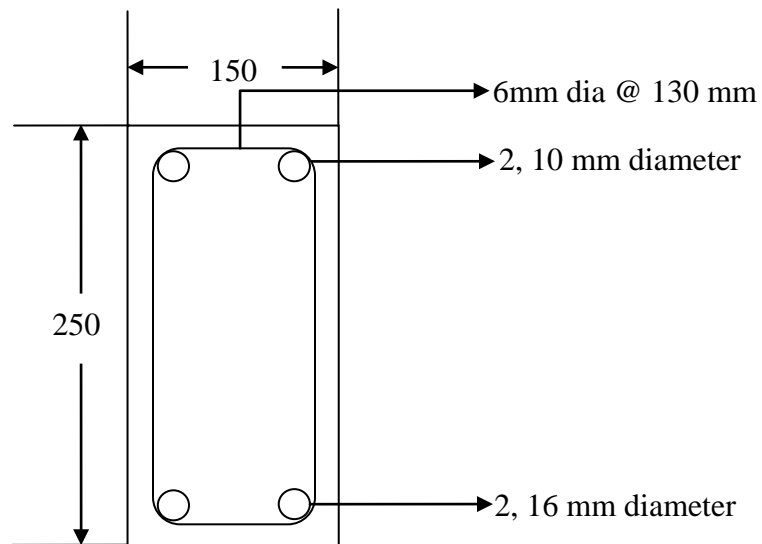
Reinforcement Detailing of Beam at Sec-A-A
